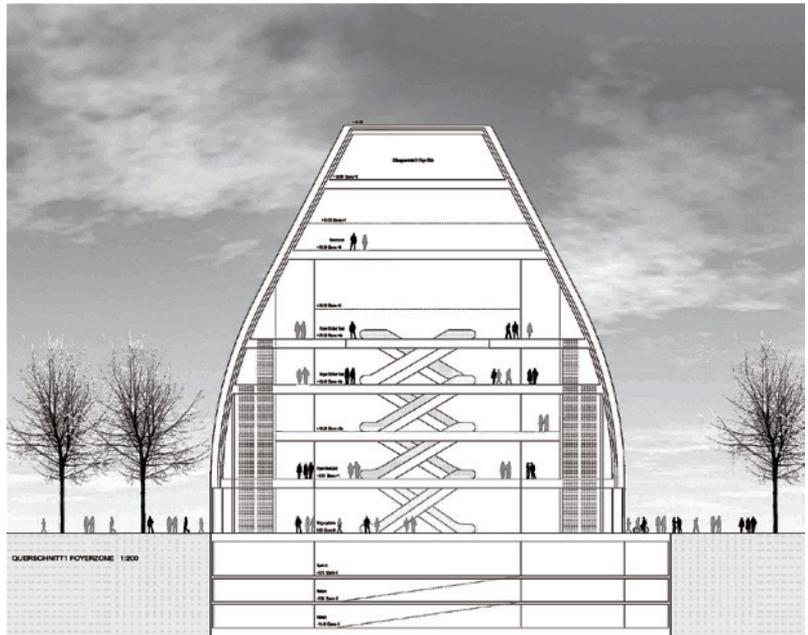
Circulation plan. *Competition Winner. Munich Concert Hall. Cukrowicz Nachbaur Architekten.* Bregenz, Austria
